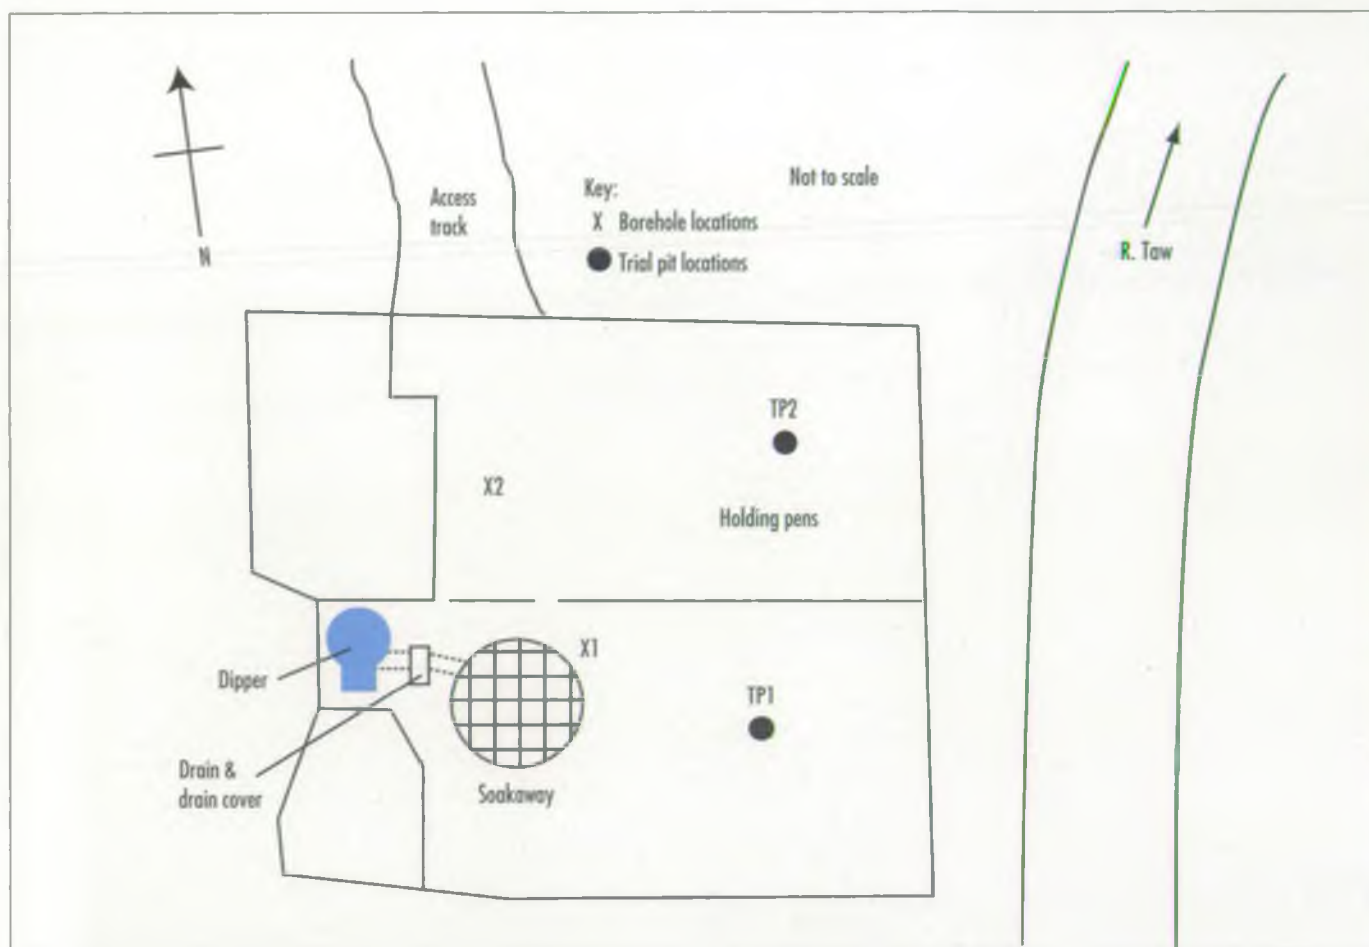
Site plan of the Dartmoor dipping site, Devon
